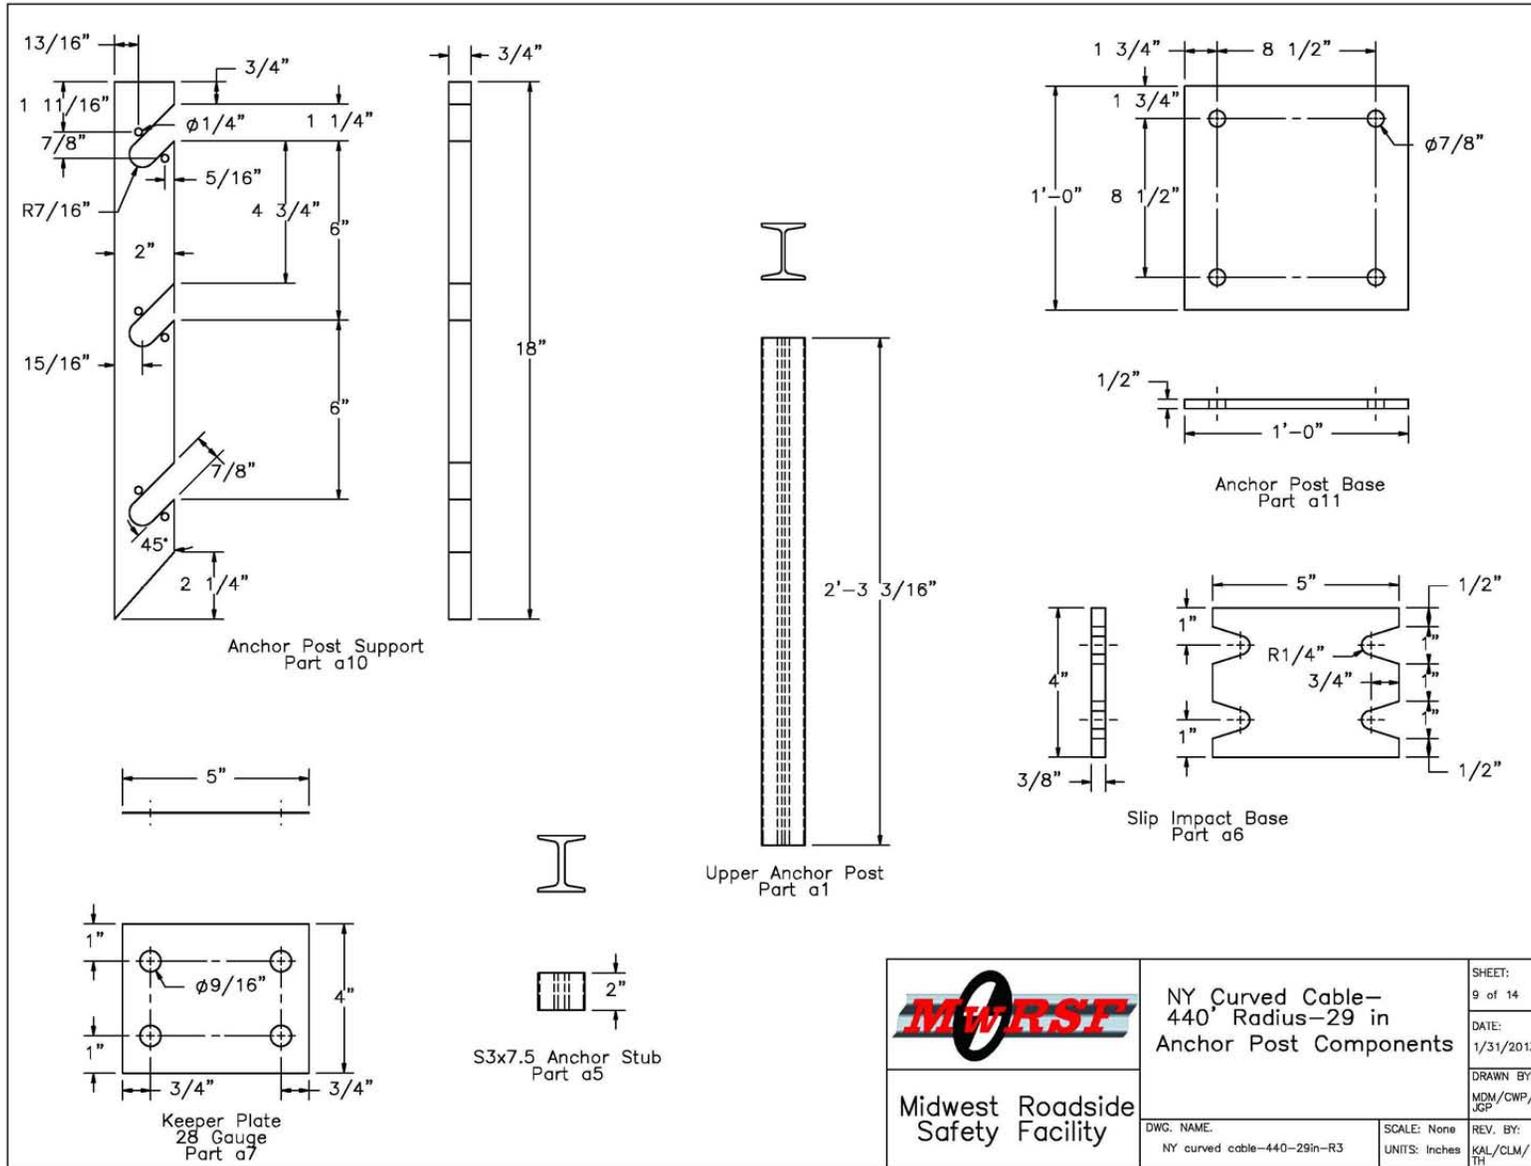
Anchor Post Component Details, Test No. NYCC-3
